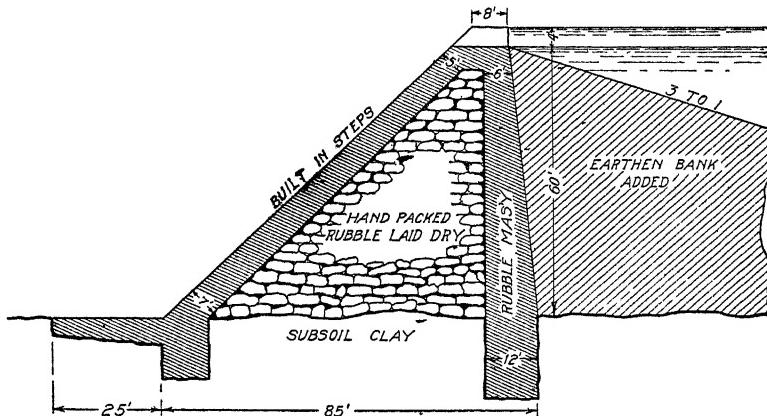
Section of Castlewood Weir Showing Construction of Stone Work Set Dry, Enclosed in Rubble Masonry
